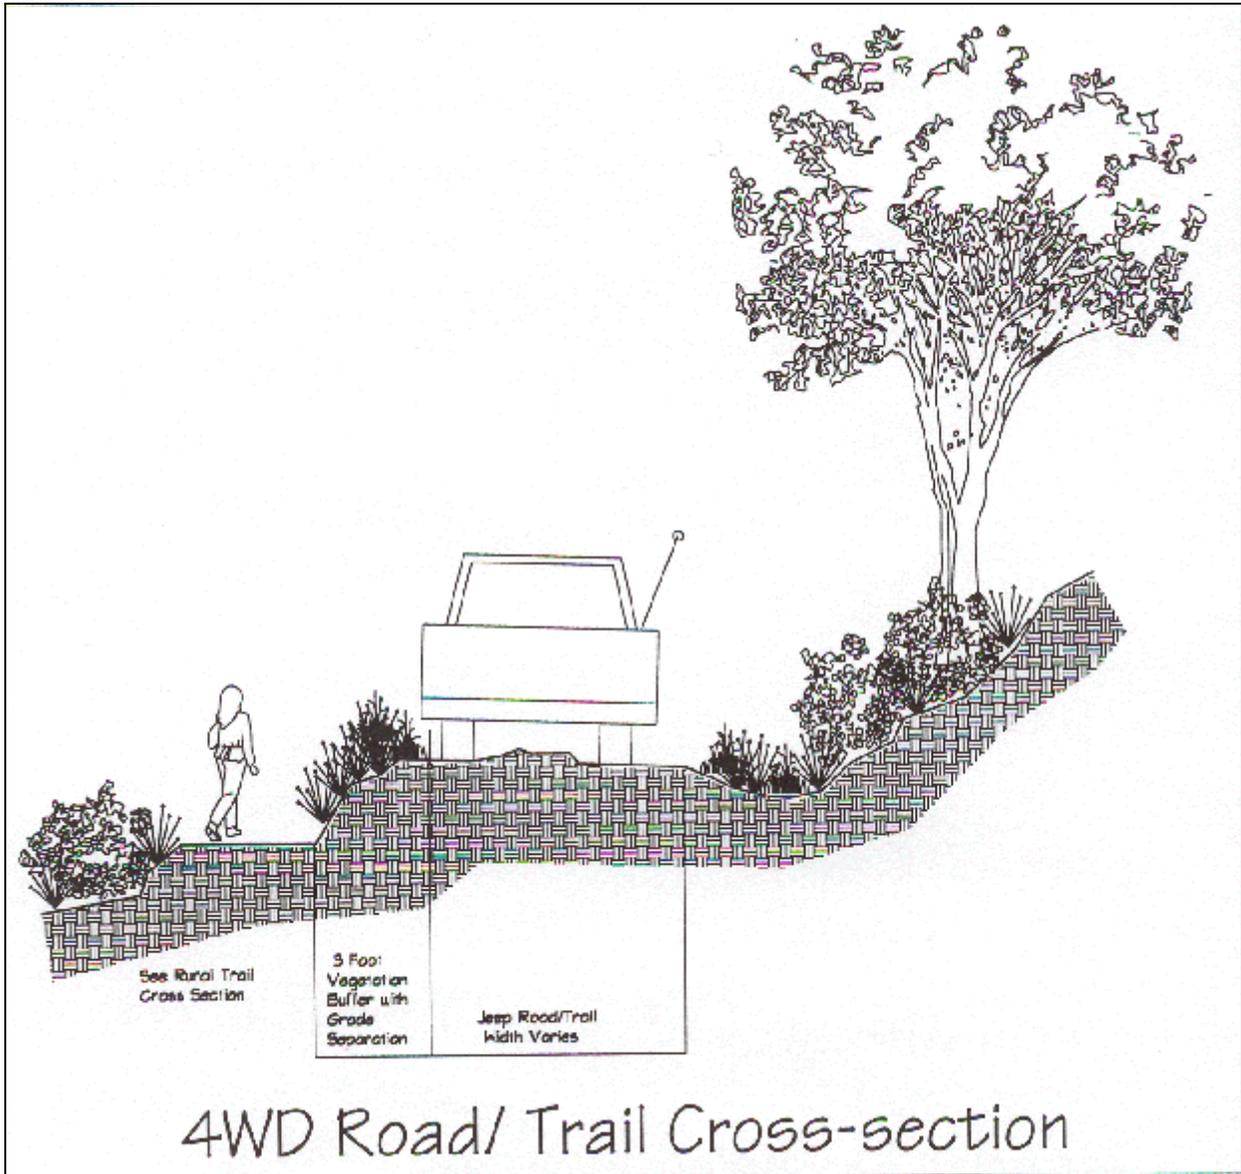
Cross-section of nonmotorized trail adjacent to road.
